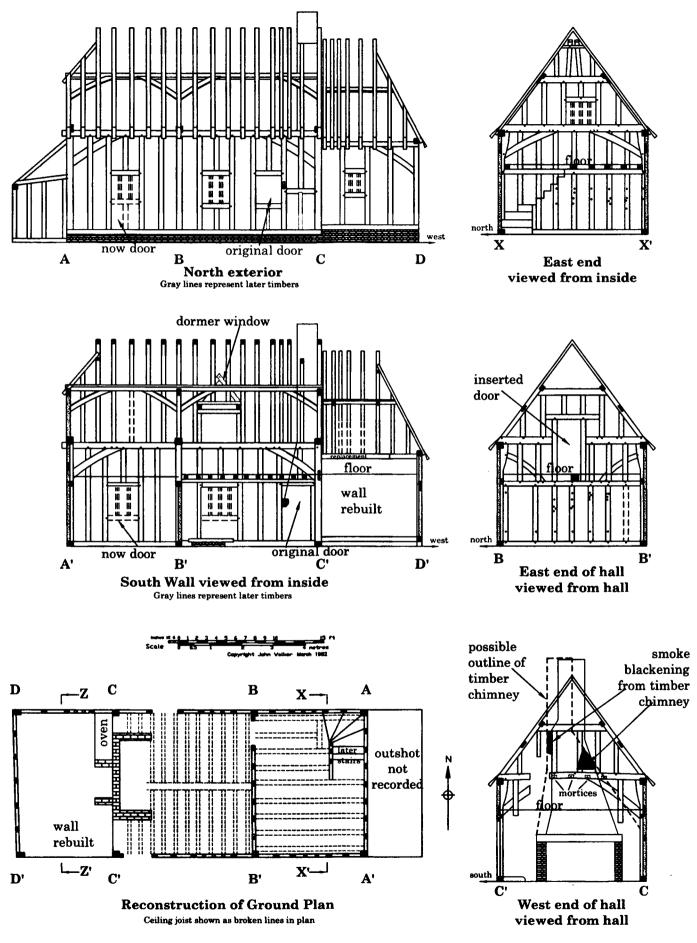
Plan and elevations of Wynter's Cottage, Magdalen Laver.
